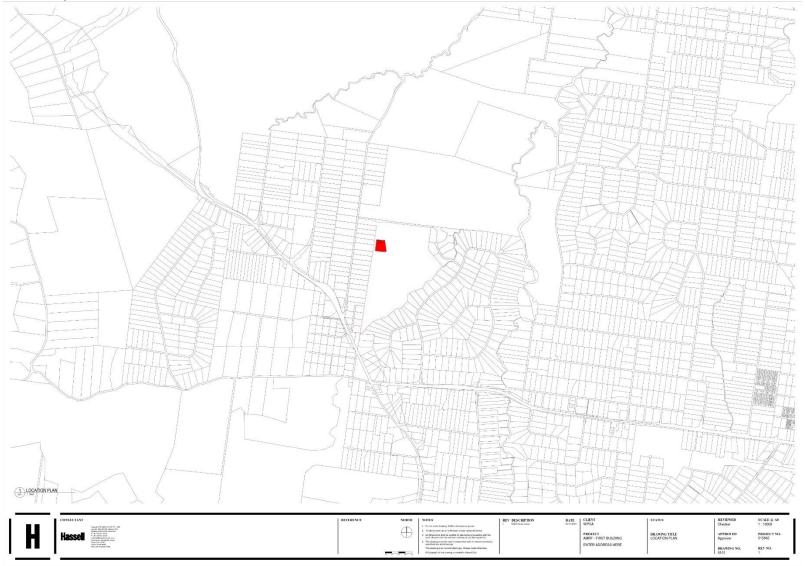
AMRF – First Building location plan (Architectural drawings prepared by Hassell, 2021).
